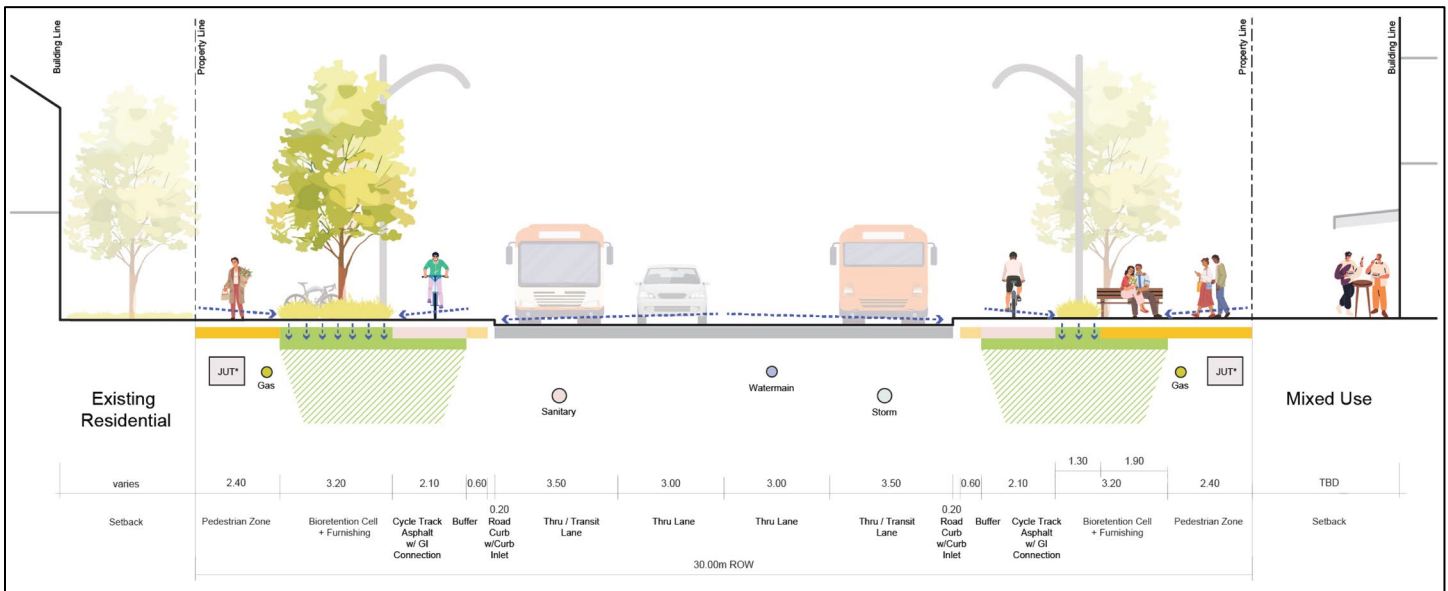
Existing Dufferin Street (Wilson Avenue to Beffort Road) Cross-Section - Option 2
